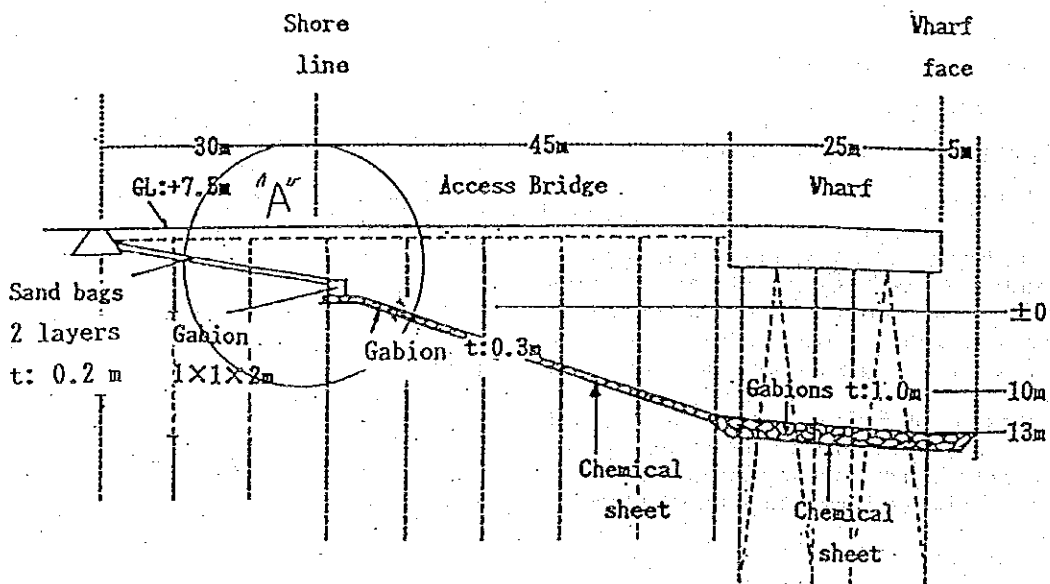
Slope Protection at Timber Products Wharf
